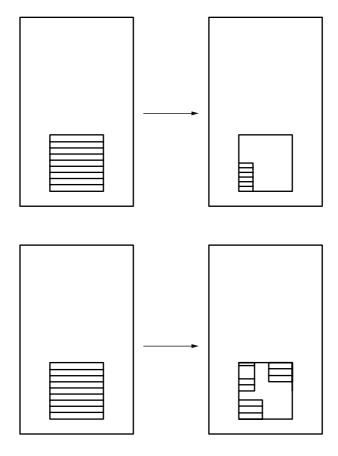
a) — Ventilation grilles (louvres) in door leaf tested with ventilation grille (Smaller size)
